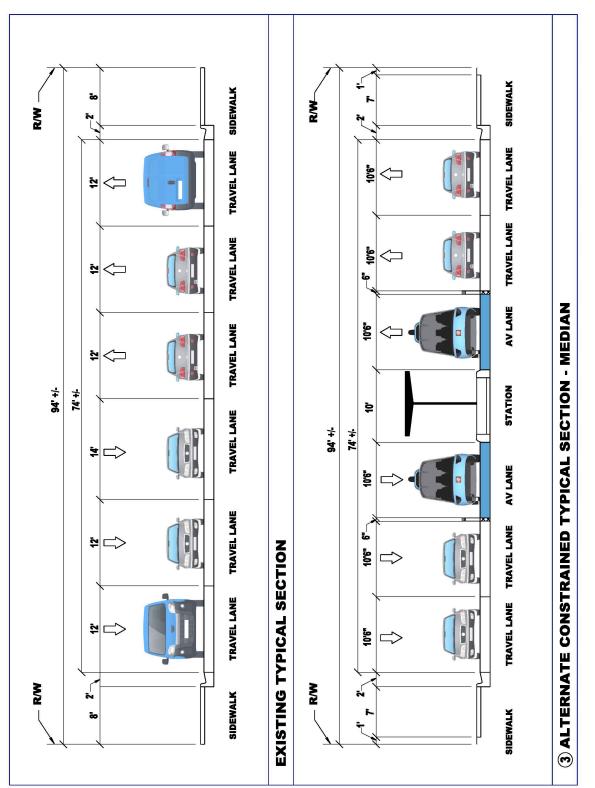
South Corridor Existing and Alternate Constrained Typical Section with Median Station San Marco Blvd north of Prudential Drive
